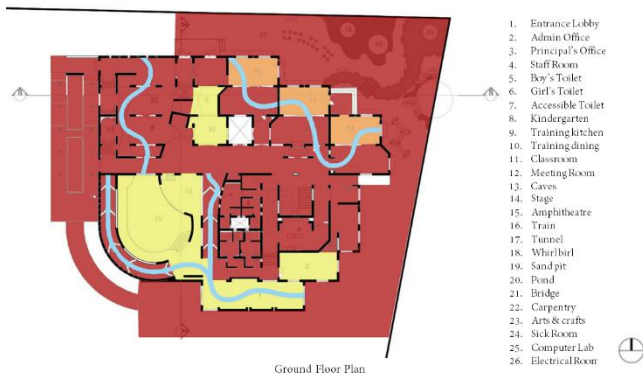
Ground Floor Plan indicating interaction rate. (Source: Author, 2023)
